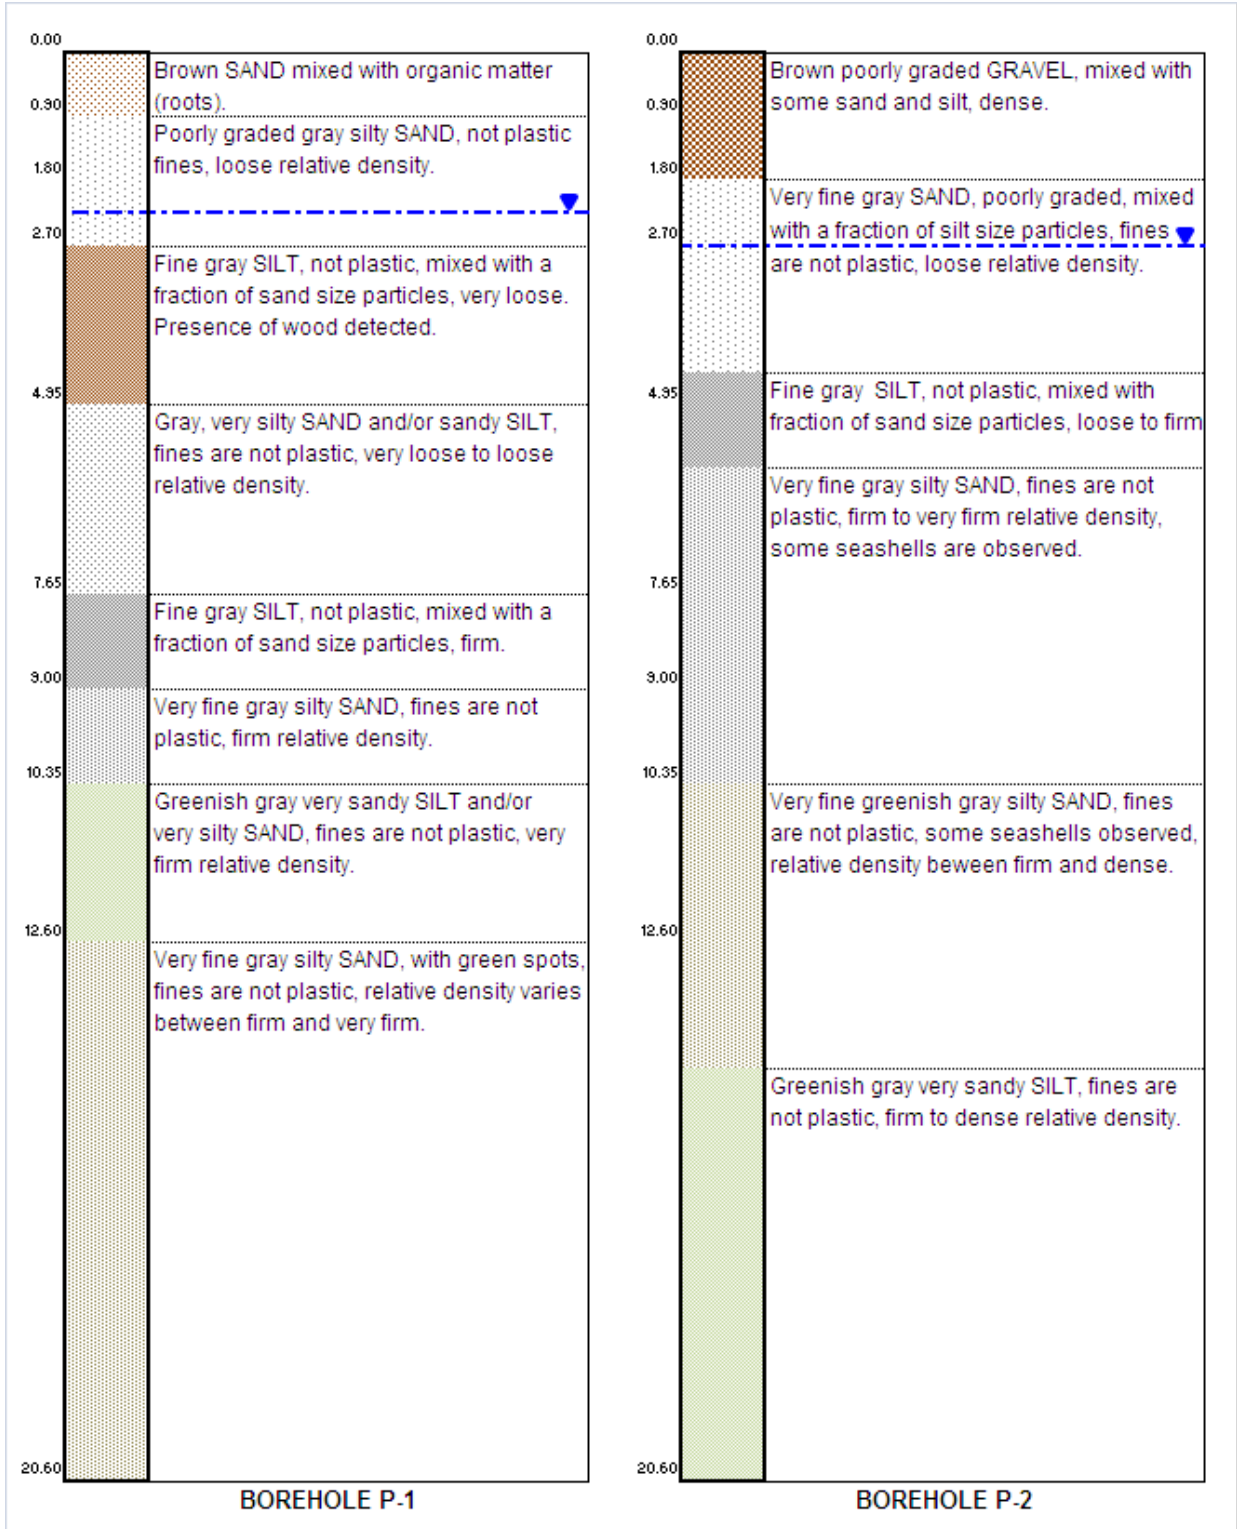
Soil profile detected at the Río Bananito Highway Bridge site
